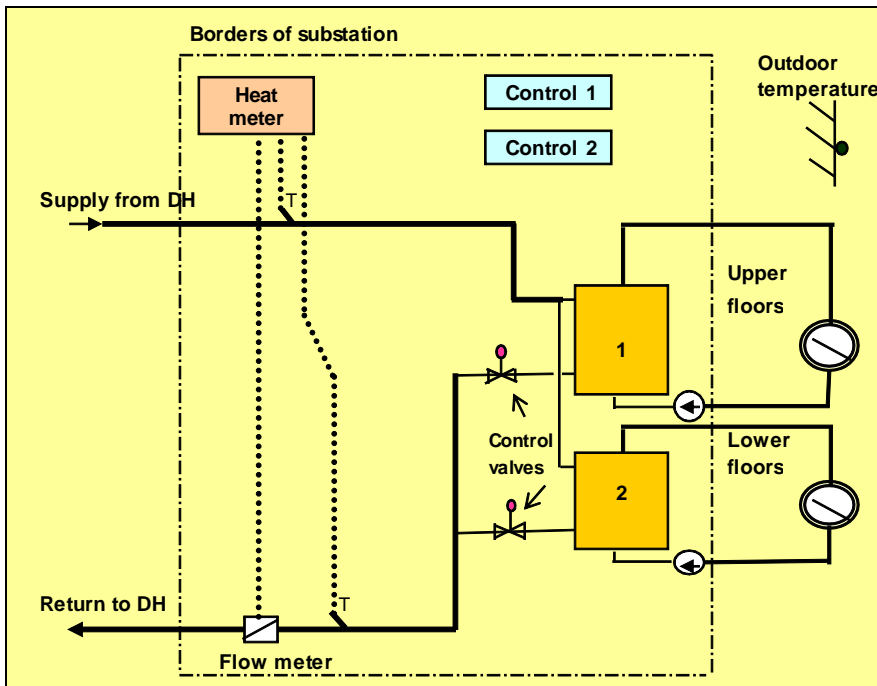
The BLS for up to 24 floors in building with two heat exchangers and control systems, one for floors 1–12 and the other one for 13–24. More heat exchangers and control systems can be added if more floors exist in the particular building. No changes in the primary network are needed.
